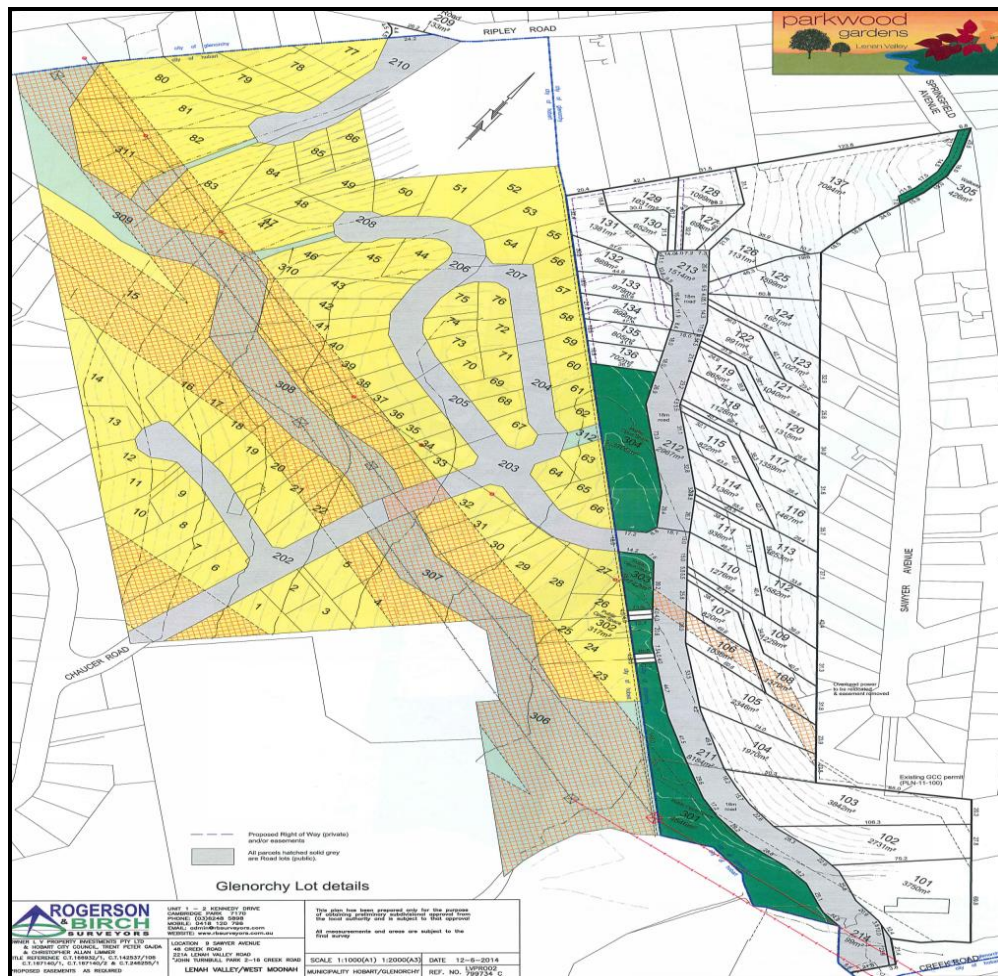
Location plan of road proposed to be named Kiewa Rise.
